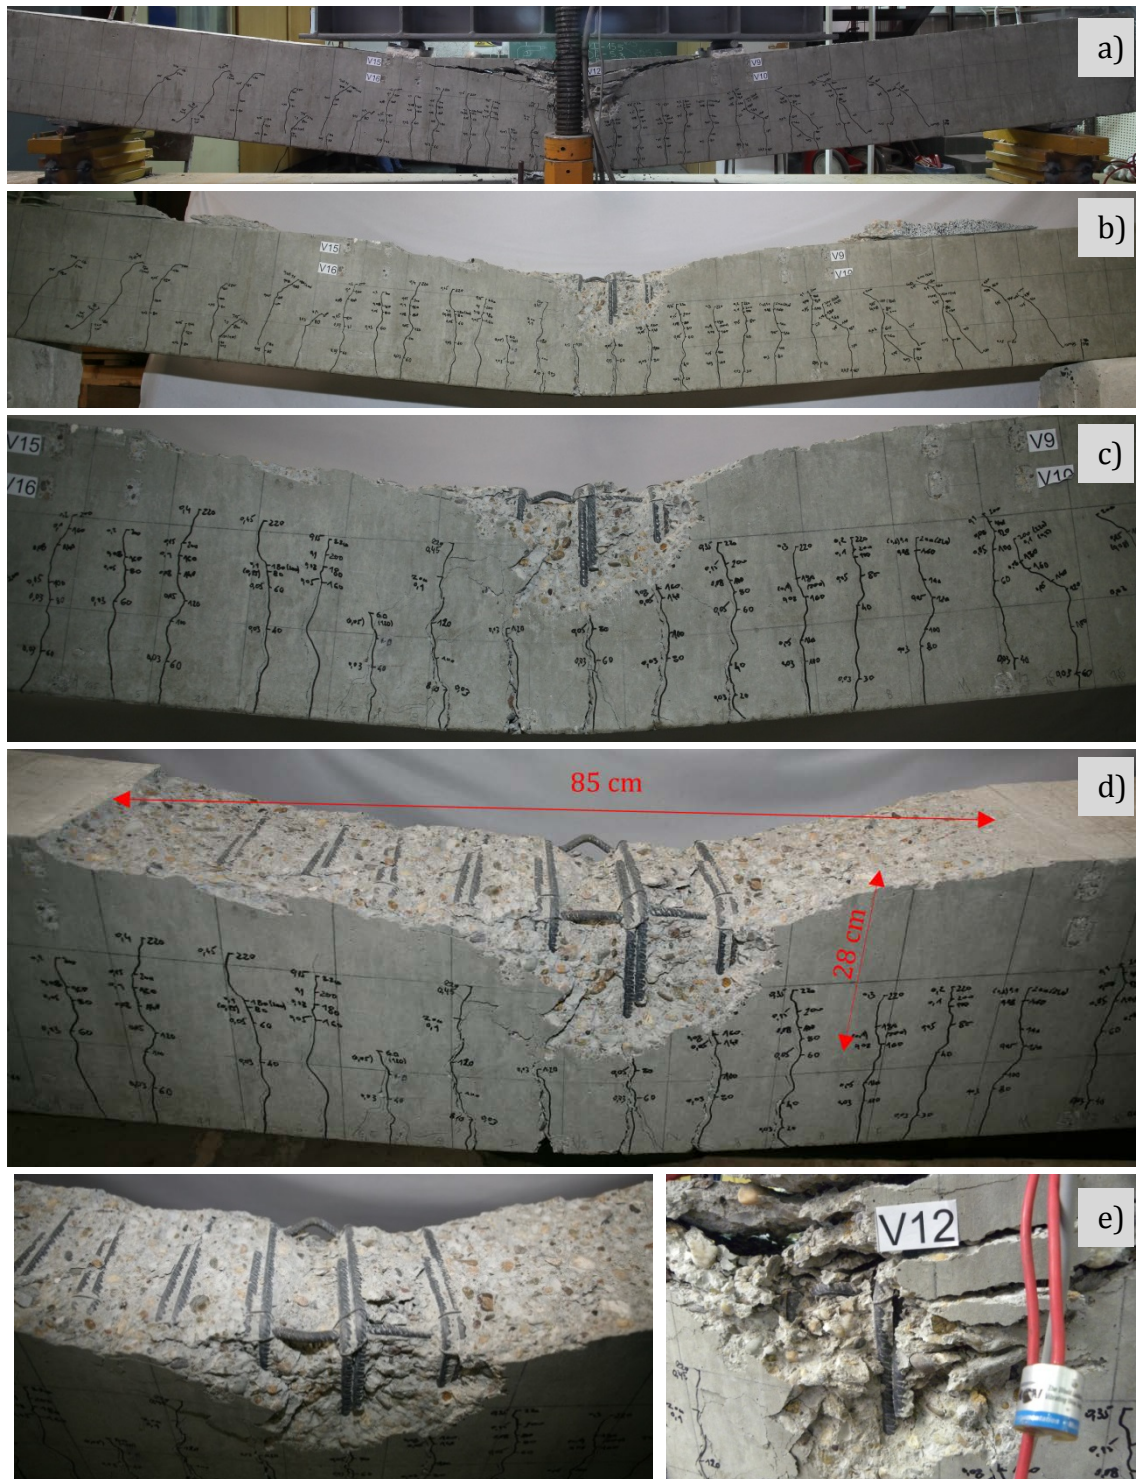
Crack patterns at the failure load for the OPC-2 beam: a-b) back side of beams' clear span, c-d) back side of beams' flexural span, e) buckling of the compressed reinforcement
